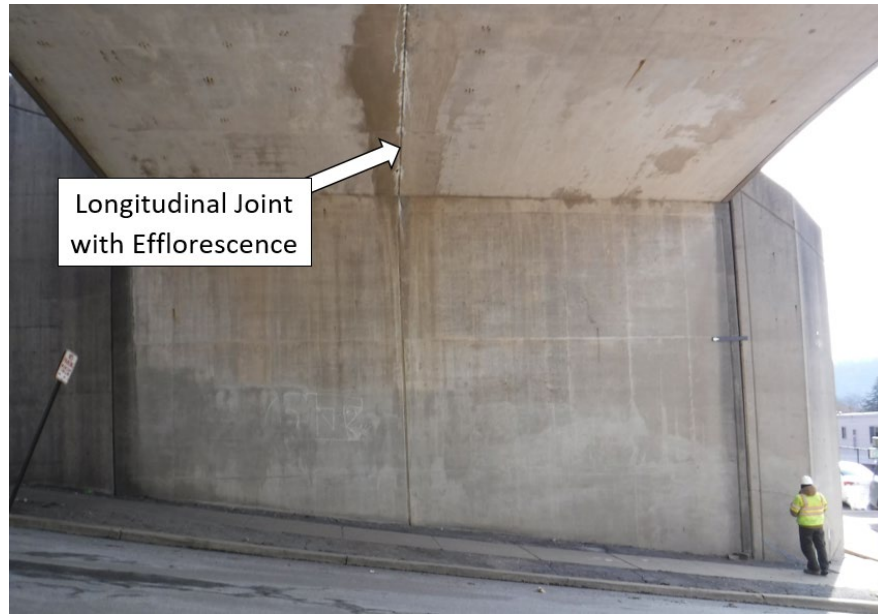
Longitudinal Joint Between Slab Frames
